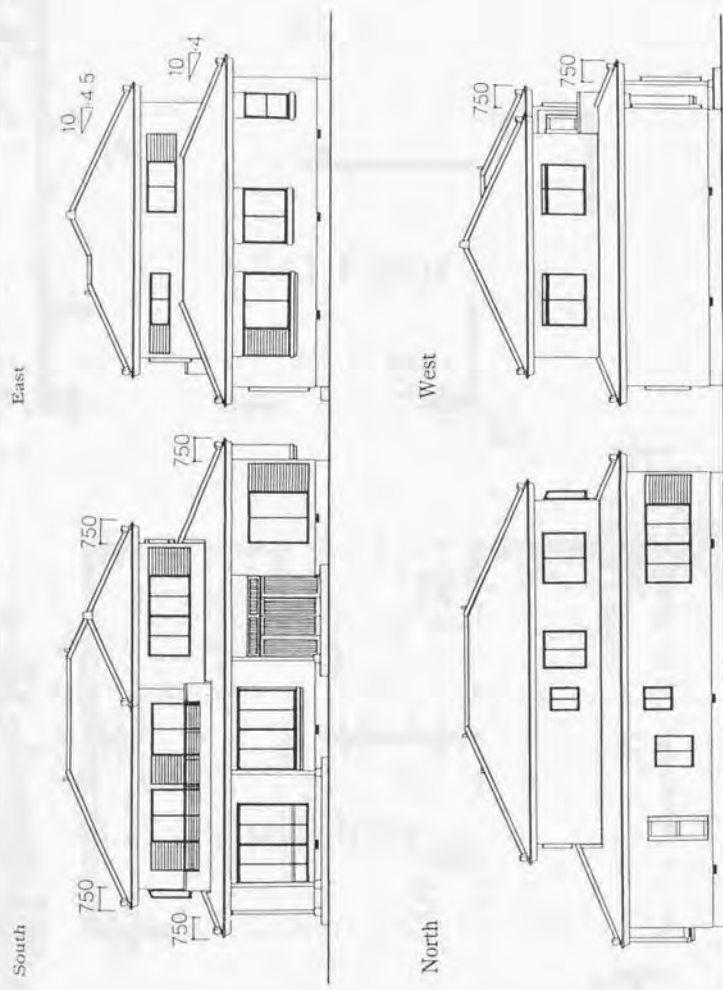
2. 1. The schematic elevation of tested full-sized 2-story Japanese conventional wooden house.
